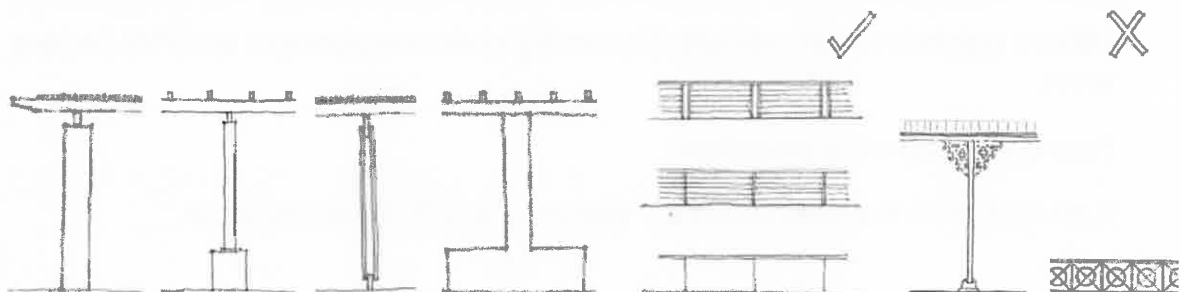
Detailing of Balustrades, Verandas and Pergolas:
